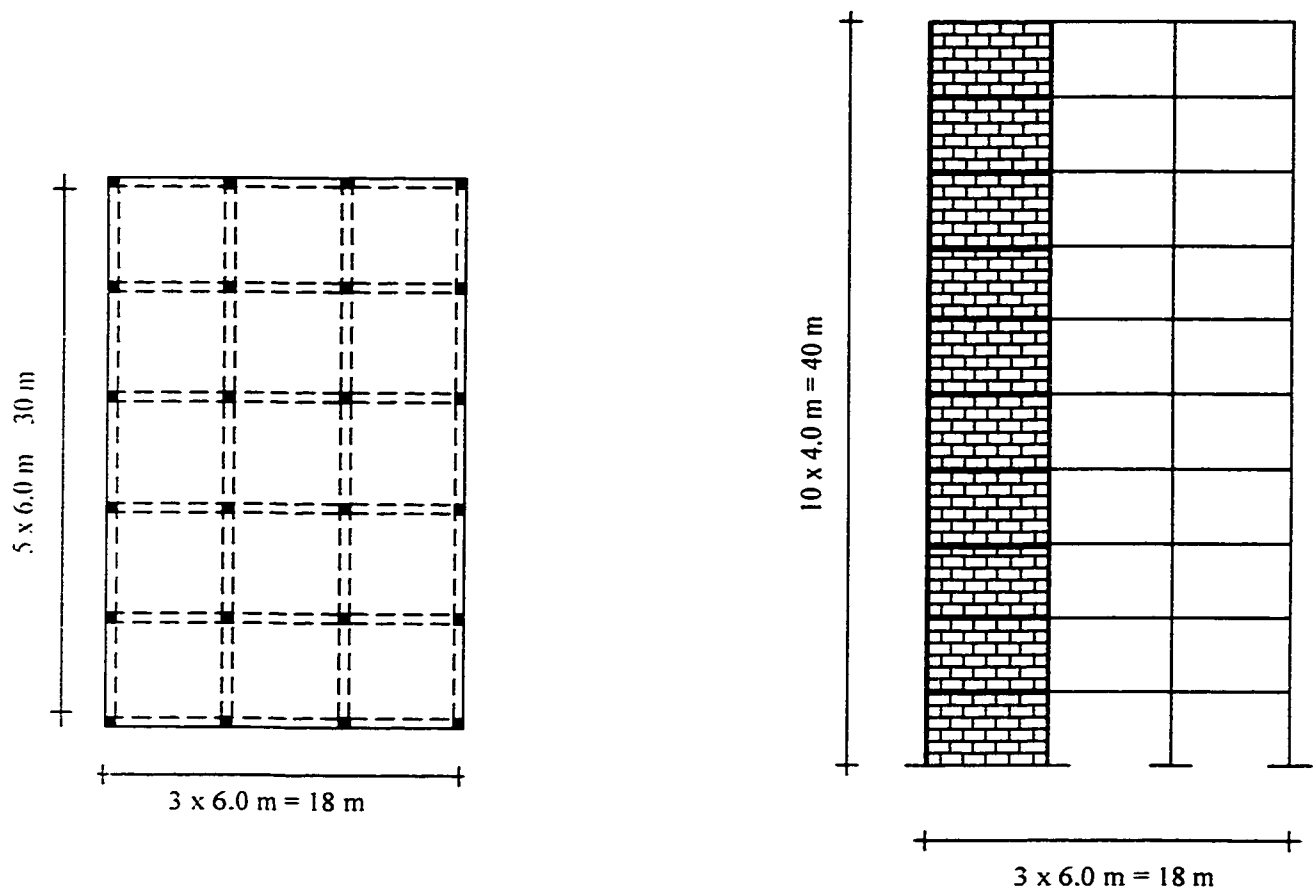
Typical plan and elevation for 5-, 10- and 15-storey moment-resisting frame models
